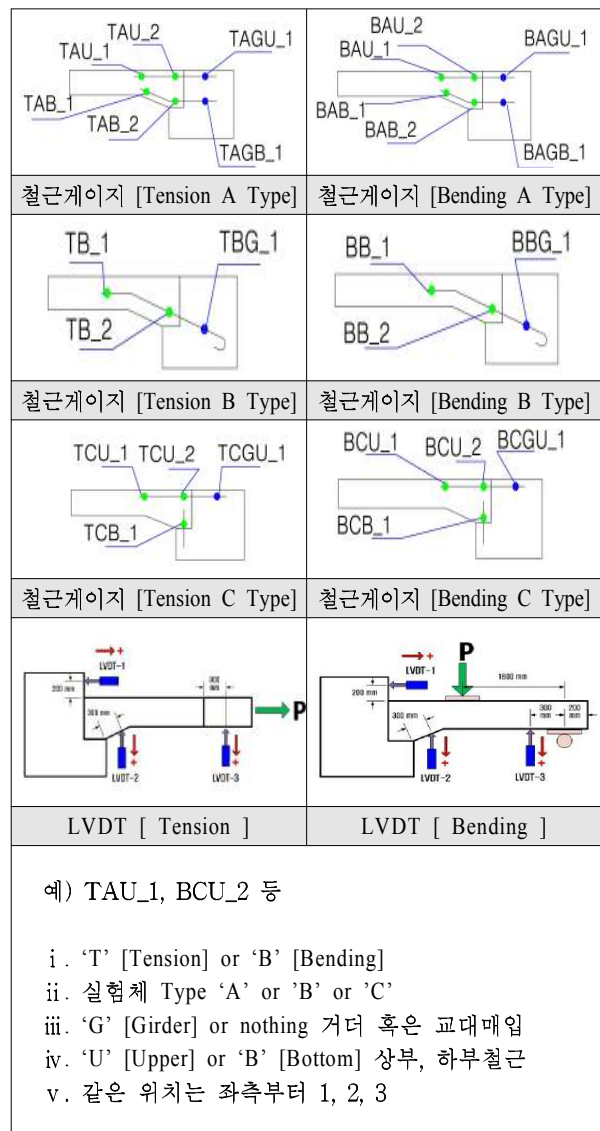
Experimental Specimens and Gauge Plan for Direct Tensile and Bending Test
